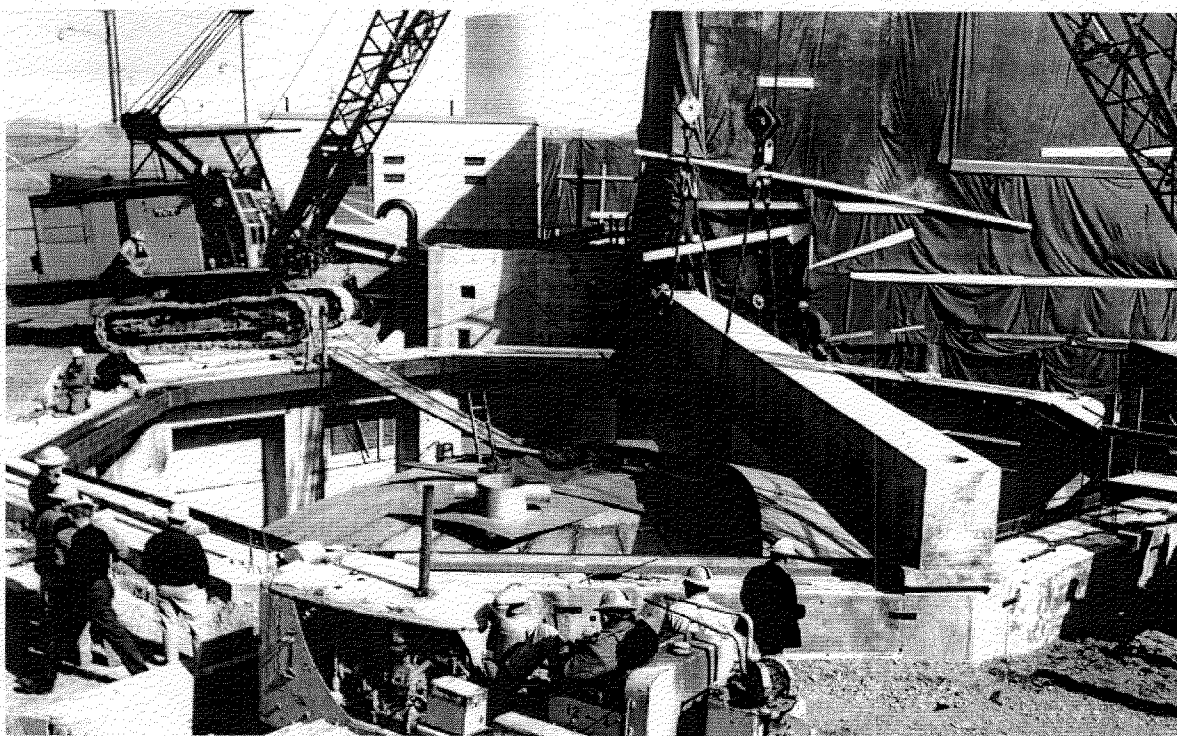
Typical 300,000-gal underground pillar and panel storage tank.
